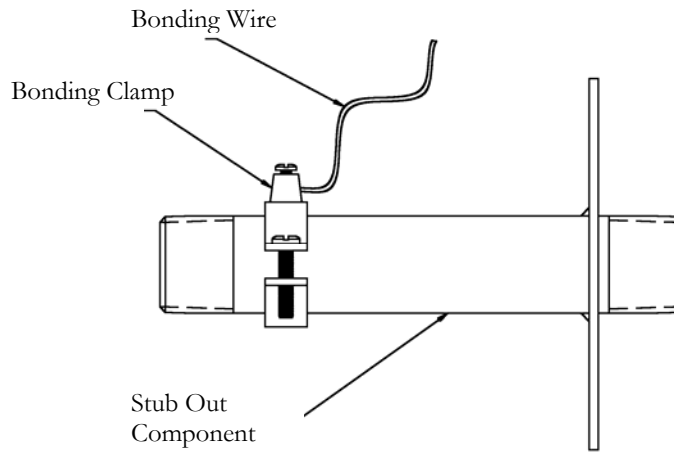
Bonding Clamp on Steel Pipe Segment
